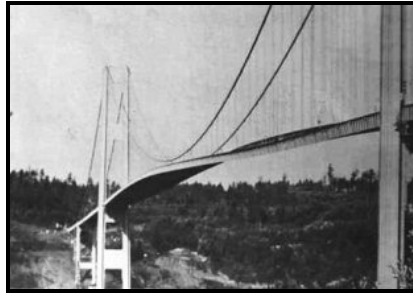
Torsion cracks (Source: <http://www.damninteresting.com>)
